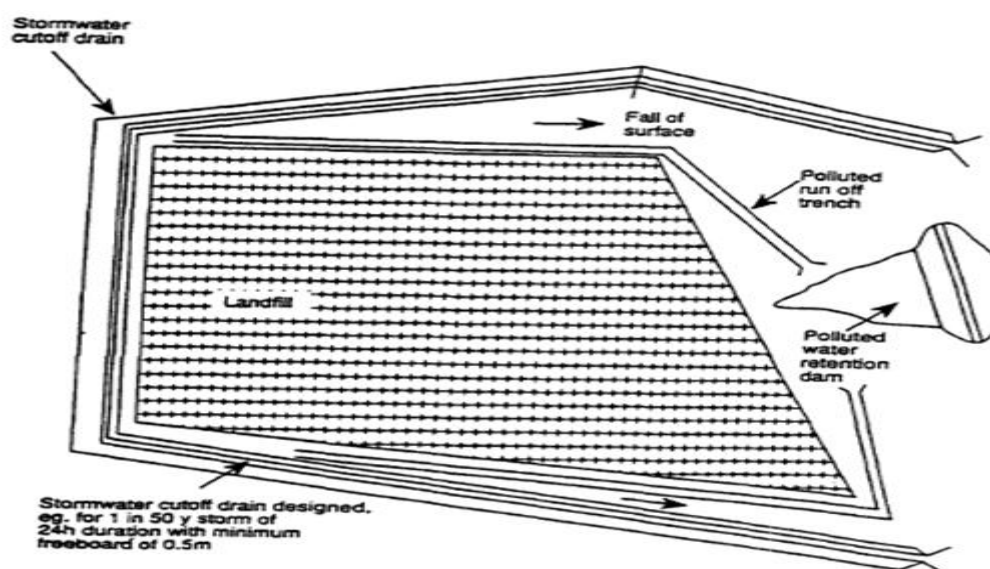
Plan view of Capped Landfill and Surface Water Drainage Channels
